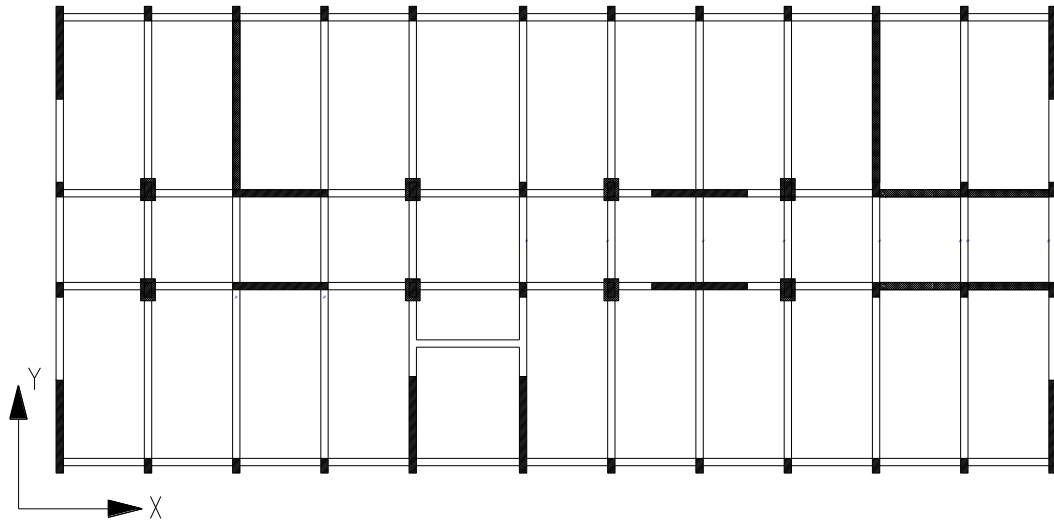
Plan View of the Retrofitted Sarıyer MEV Dumlupınar Primary School
